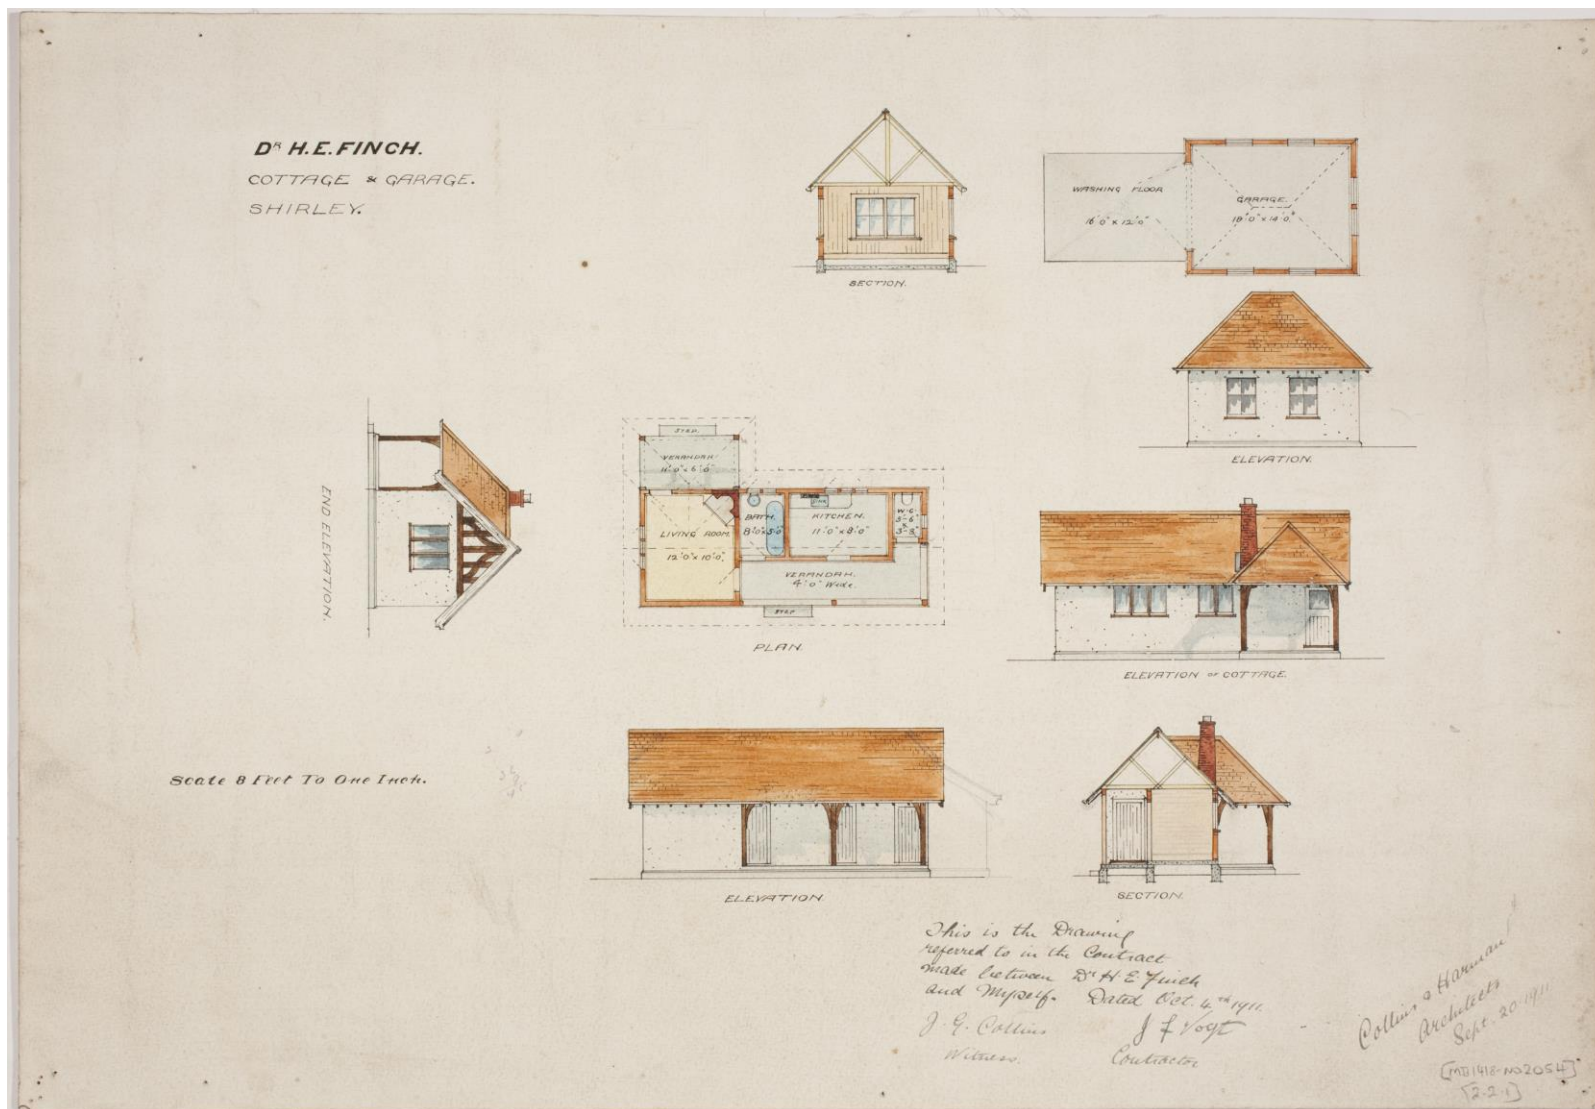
Collins and Harman, Dr H. E. Finch, Cottage & Garage, Shirley, plans, elevations and sections (1911).
